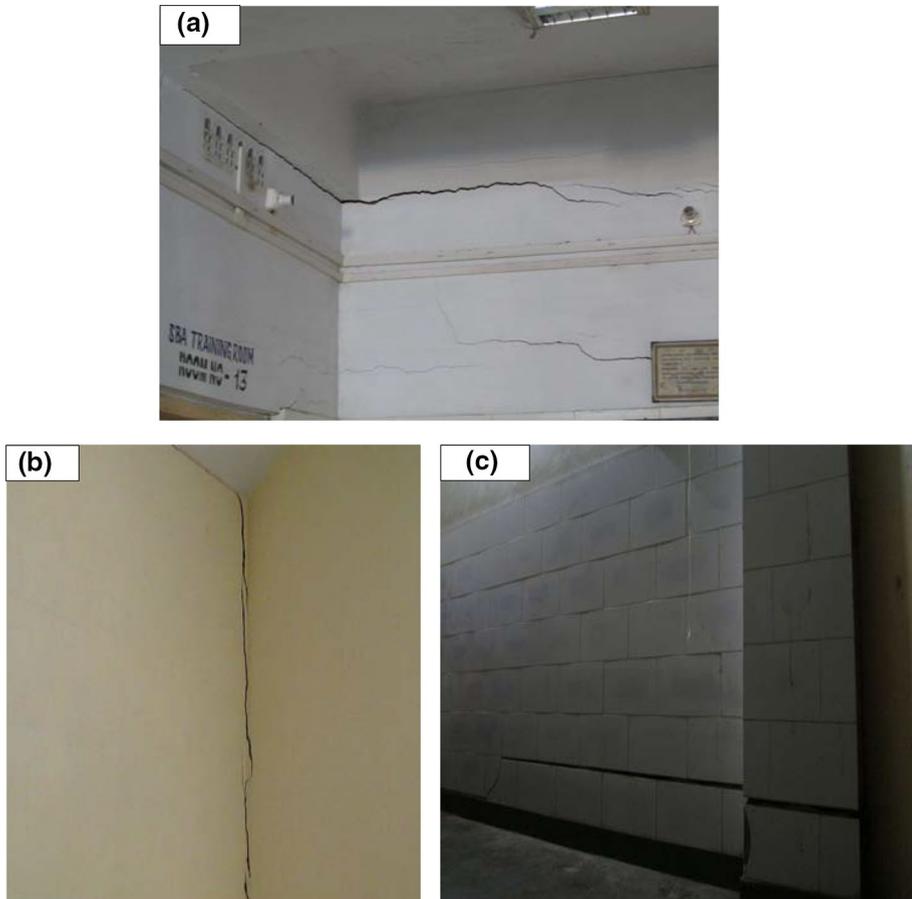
a–c Damages observed in two-storied RC frame hospital building with masonry infill
